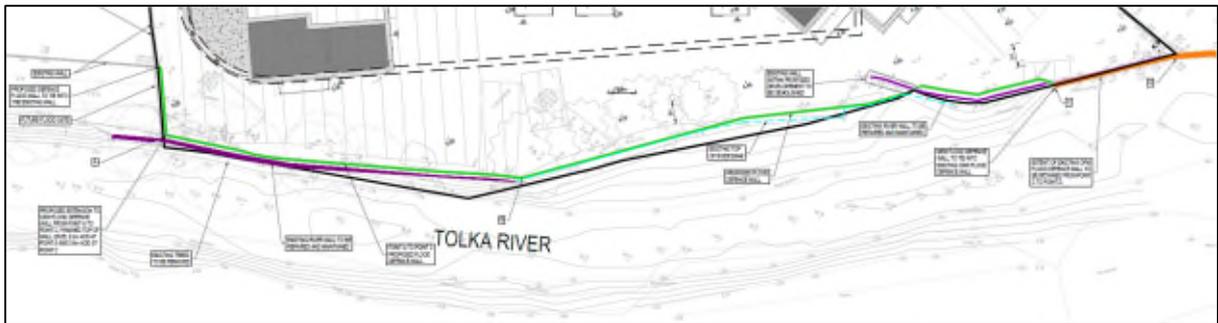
Proposed New Flood Wall Extent within Site (shown green) (extract from Drawing 210027-DBFL-XX-SP-DR-C-1020)
